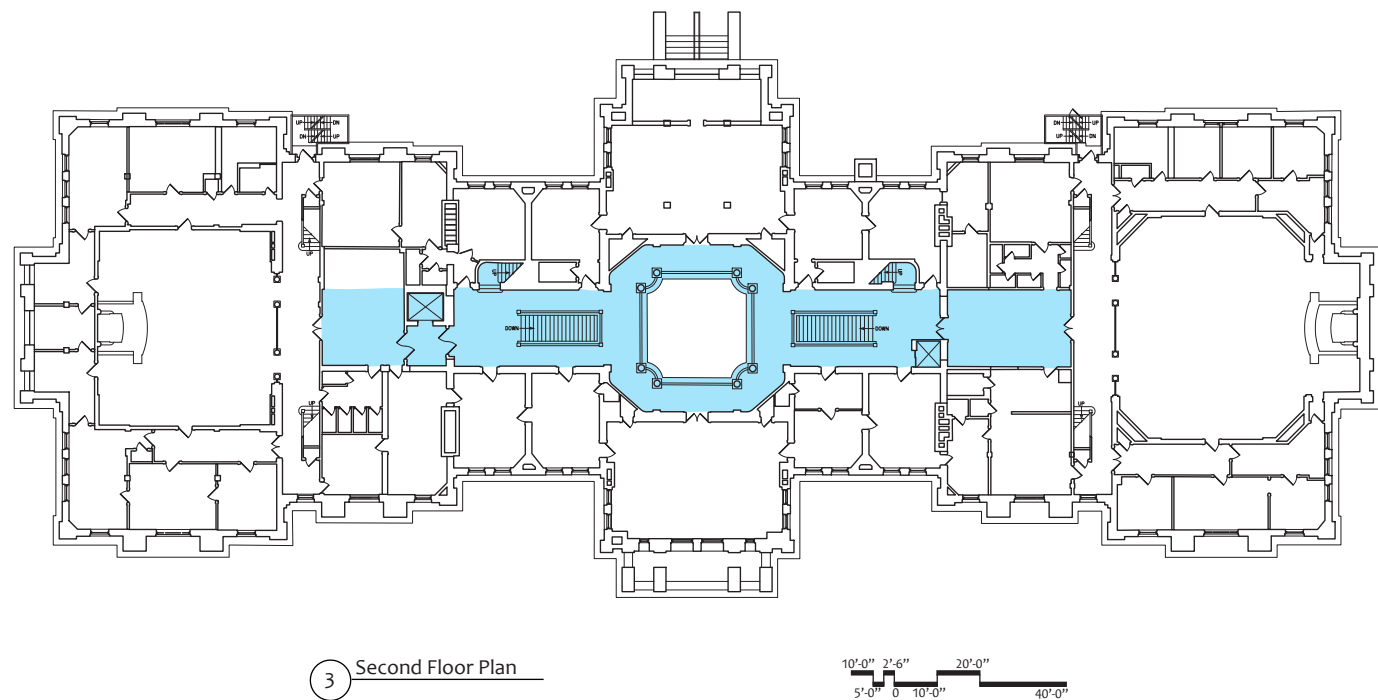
Second Floor Plan of Rotunda and Monumental Corridors [highlighted in light blue]
